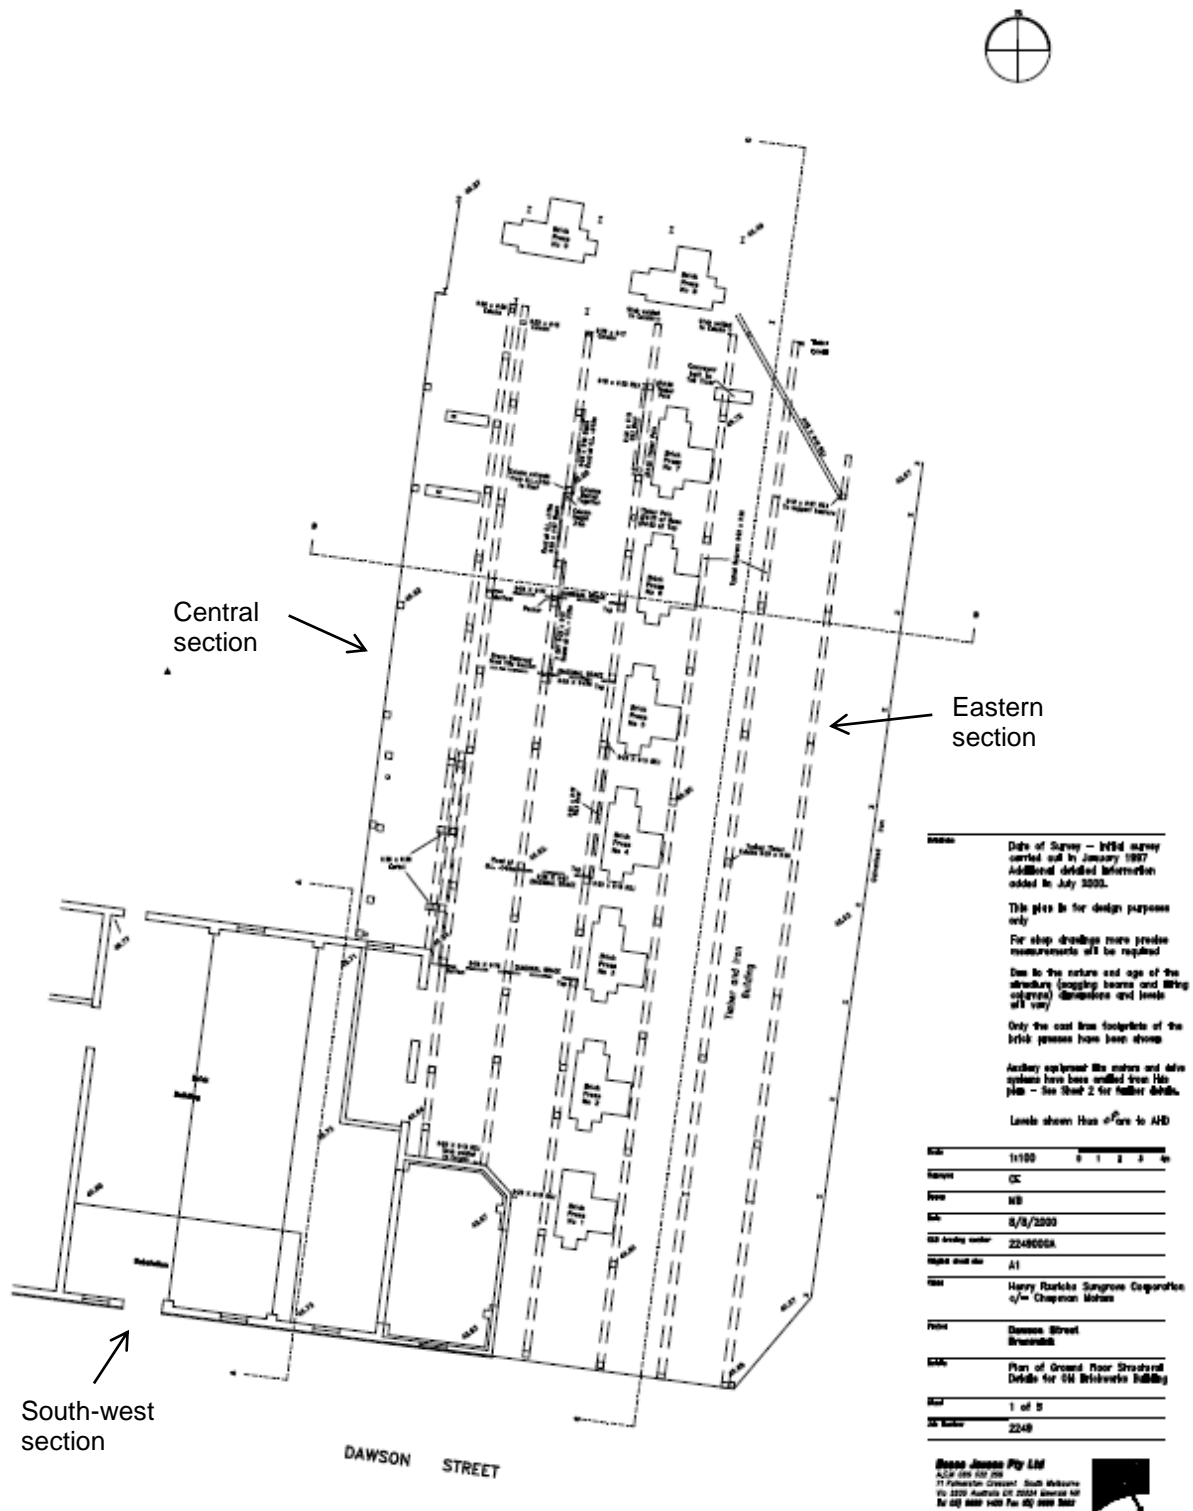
Former Brick Press Building – Ground Floor Plan
